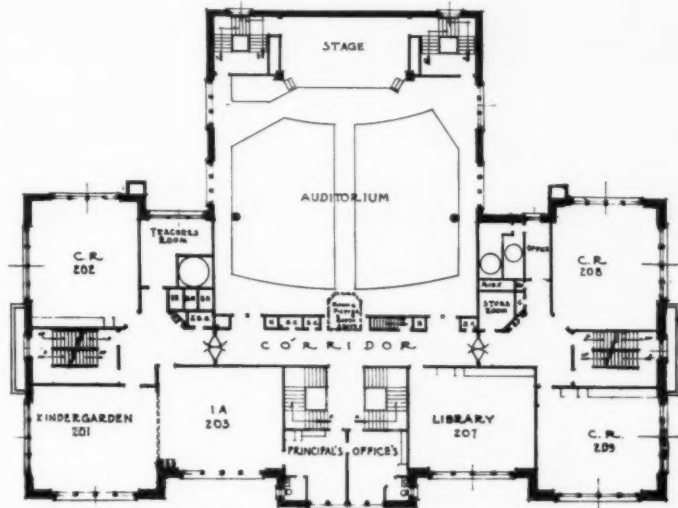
SECOND FLOOR PLAN. TYPE "C" ELEMENTARY SCHOOL
